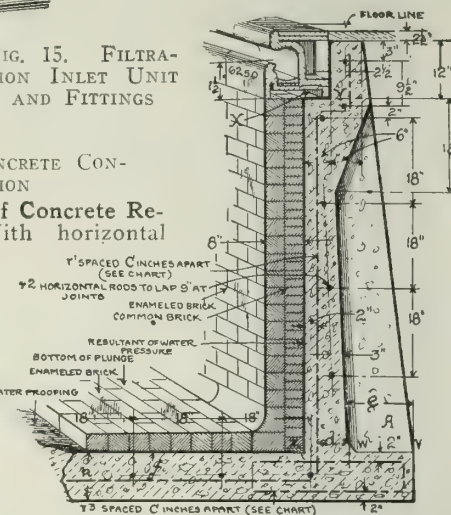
SECTION OF CONCRETE RETAINING TANK—DETAILS FURNISHED
